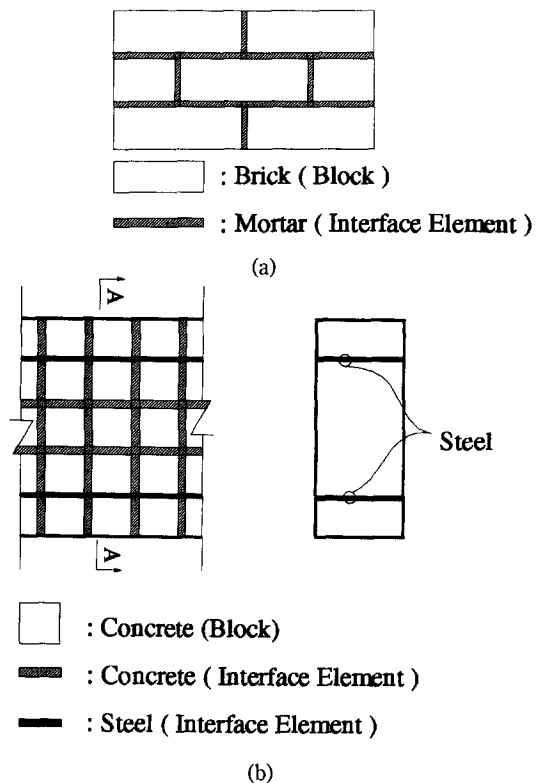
(a) Schematic configuration of element mesh of the masonry wall, (b) schematic configuration of element mesh of the reinforced concrete structure.
